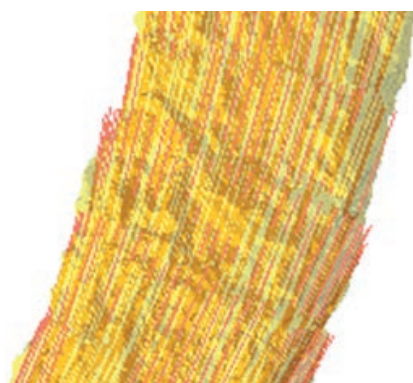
Part of tunnel 214 drilling log and tunnel scan.
